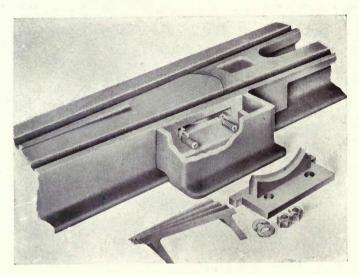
Section through Point Heel showing Tongue Heel Pin.
